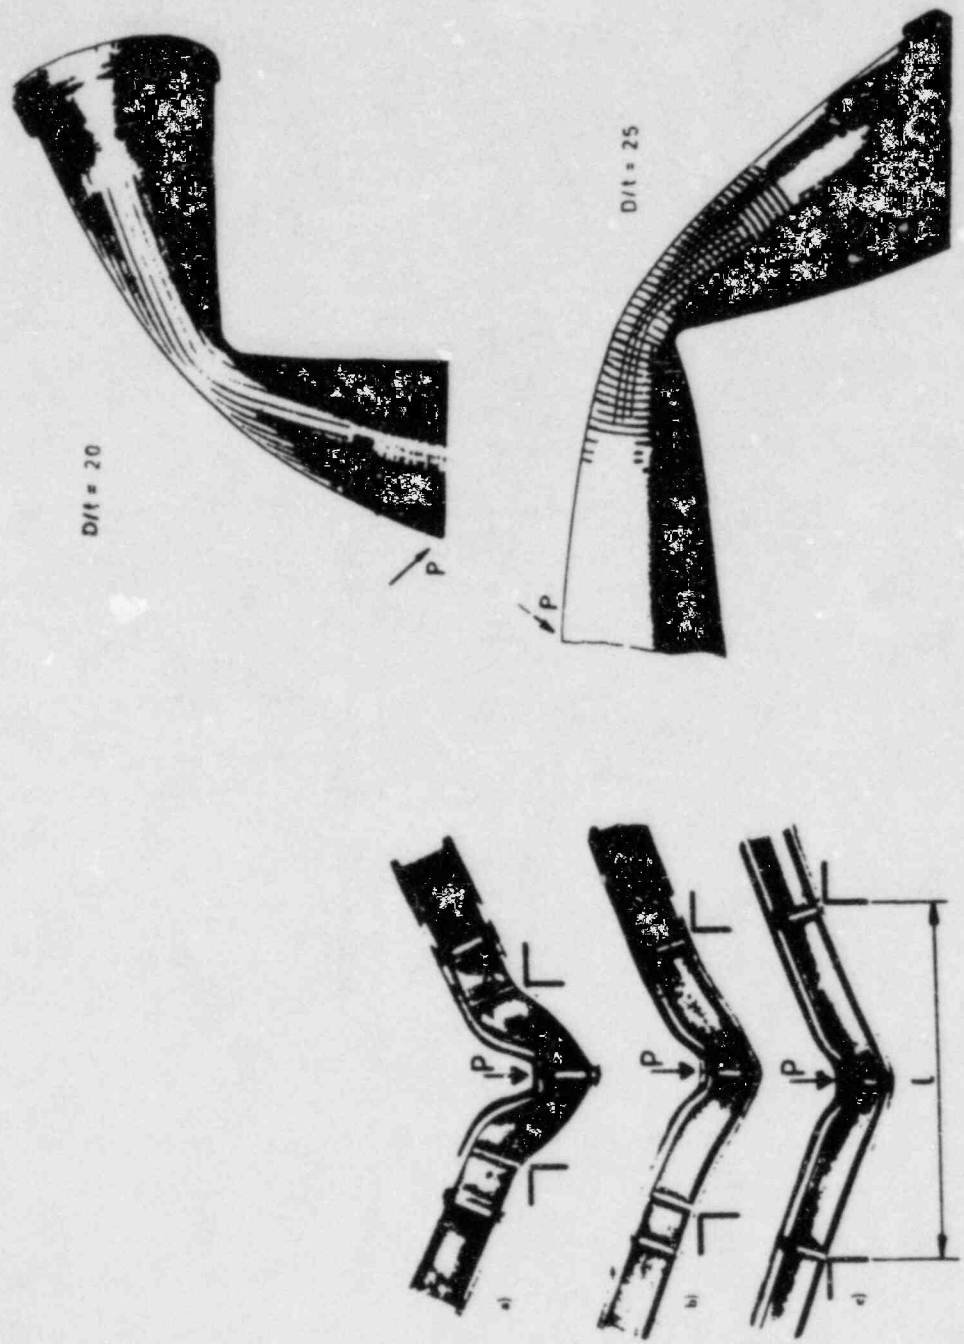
Deformation of Beams and Pipes Due to Single Loads
